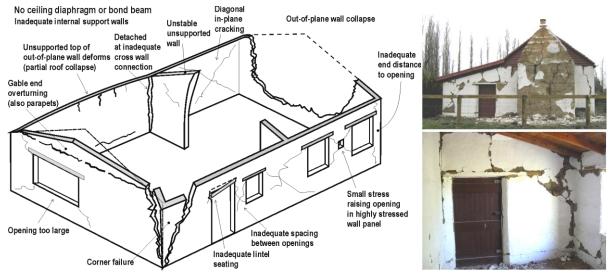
Typical failures of unreinforced earth construction (C) Morris
